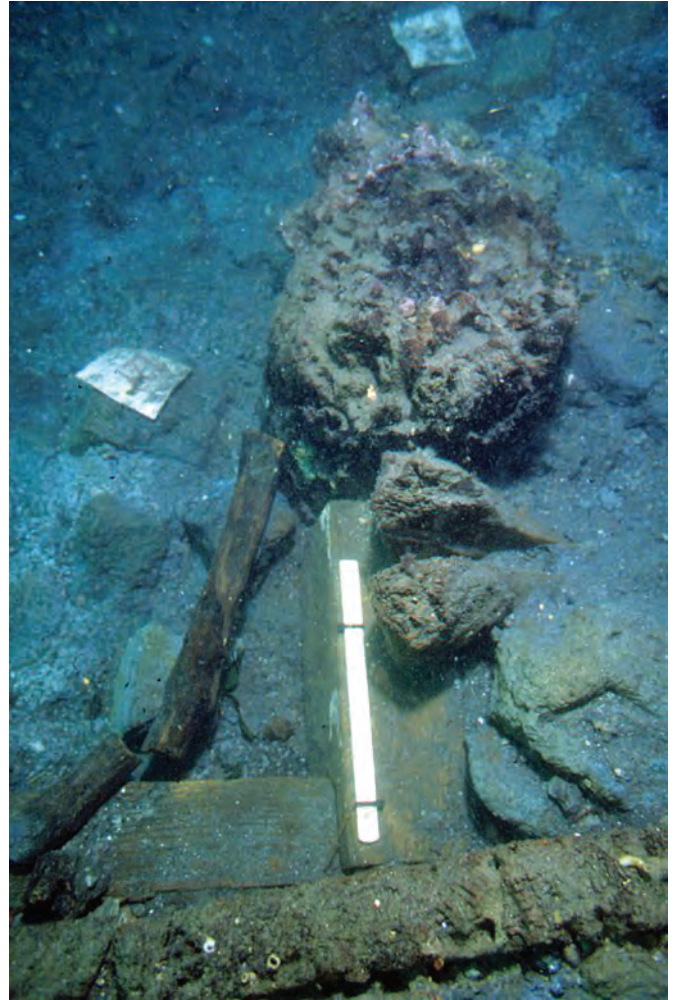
Fixing bracket securing the lower rail to a stipes on the formwork on the side of a concrete quay to the south of Punta Pennata at Misenum (Benini and Lanteri 2010: fig. 14; used with permission).
